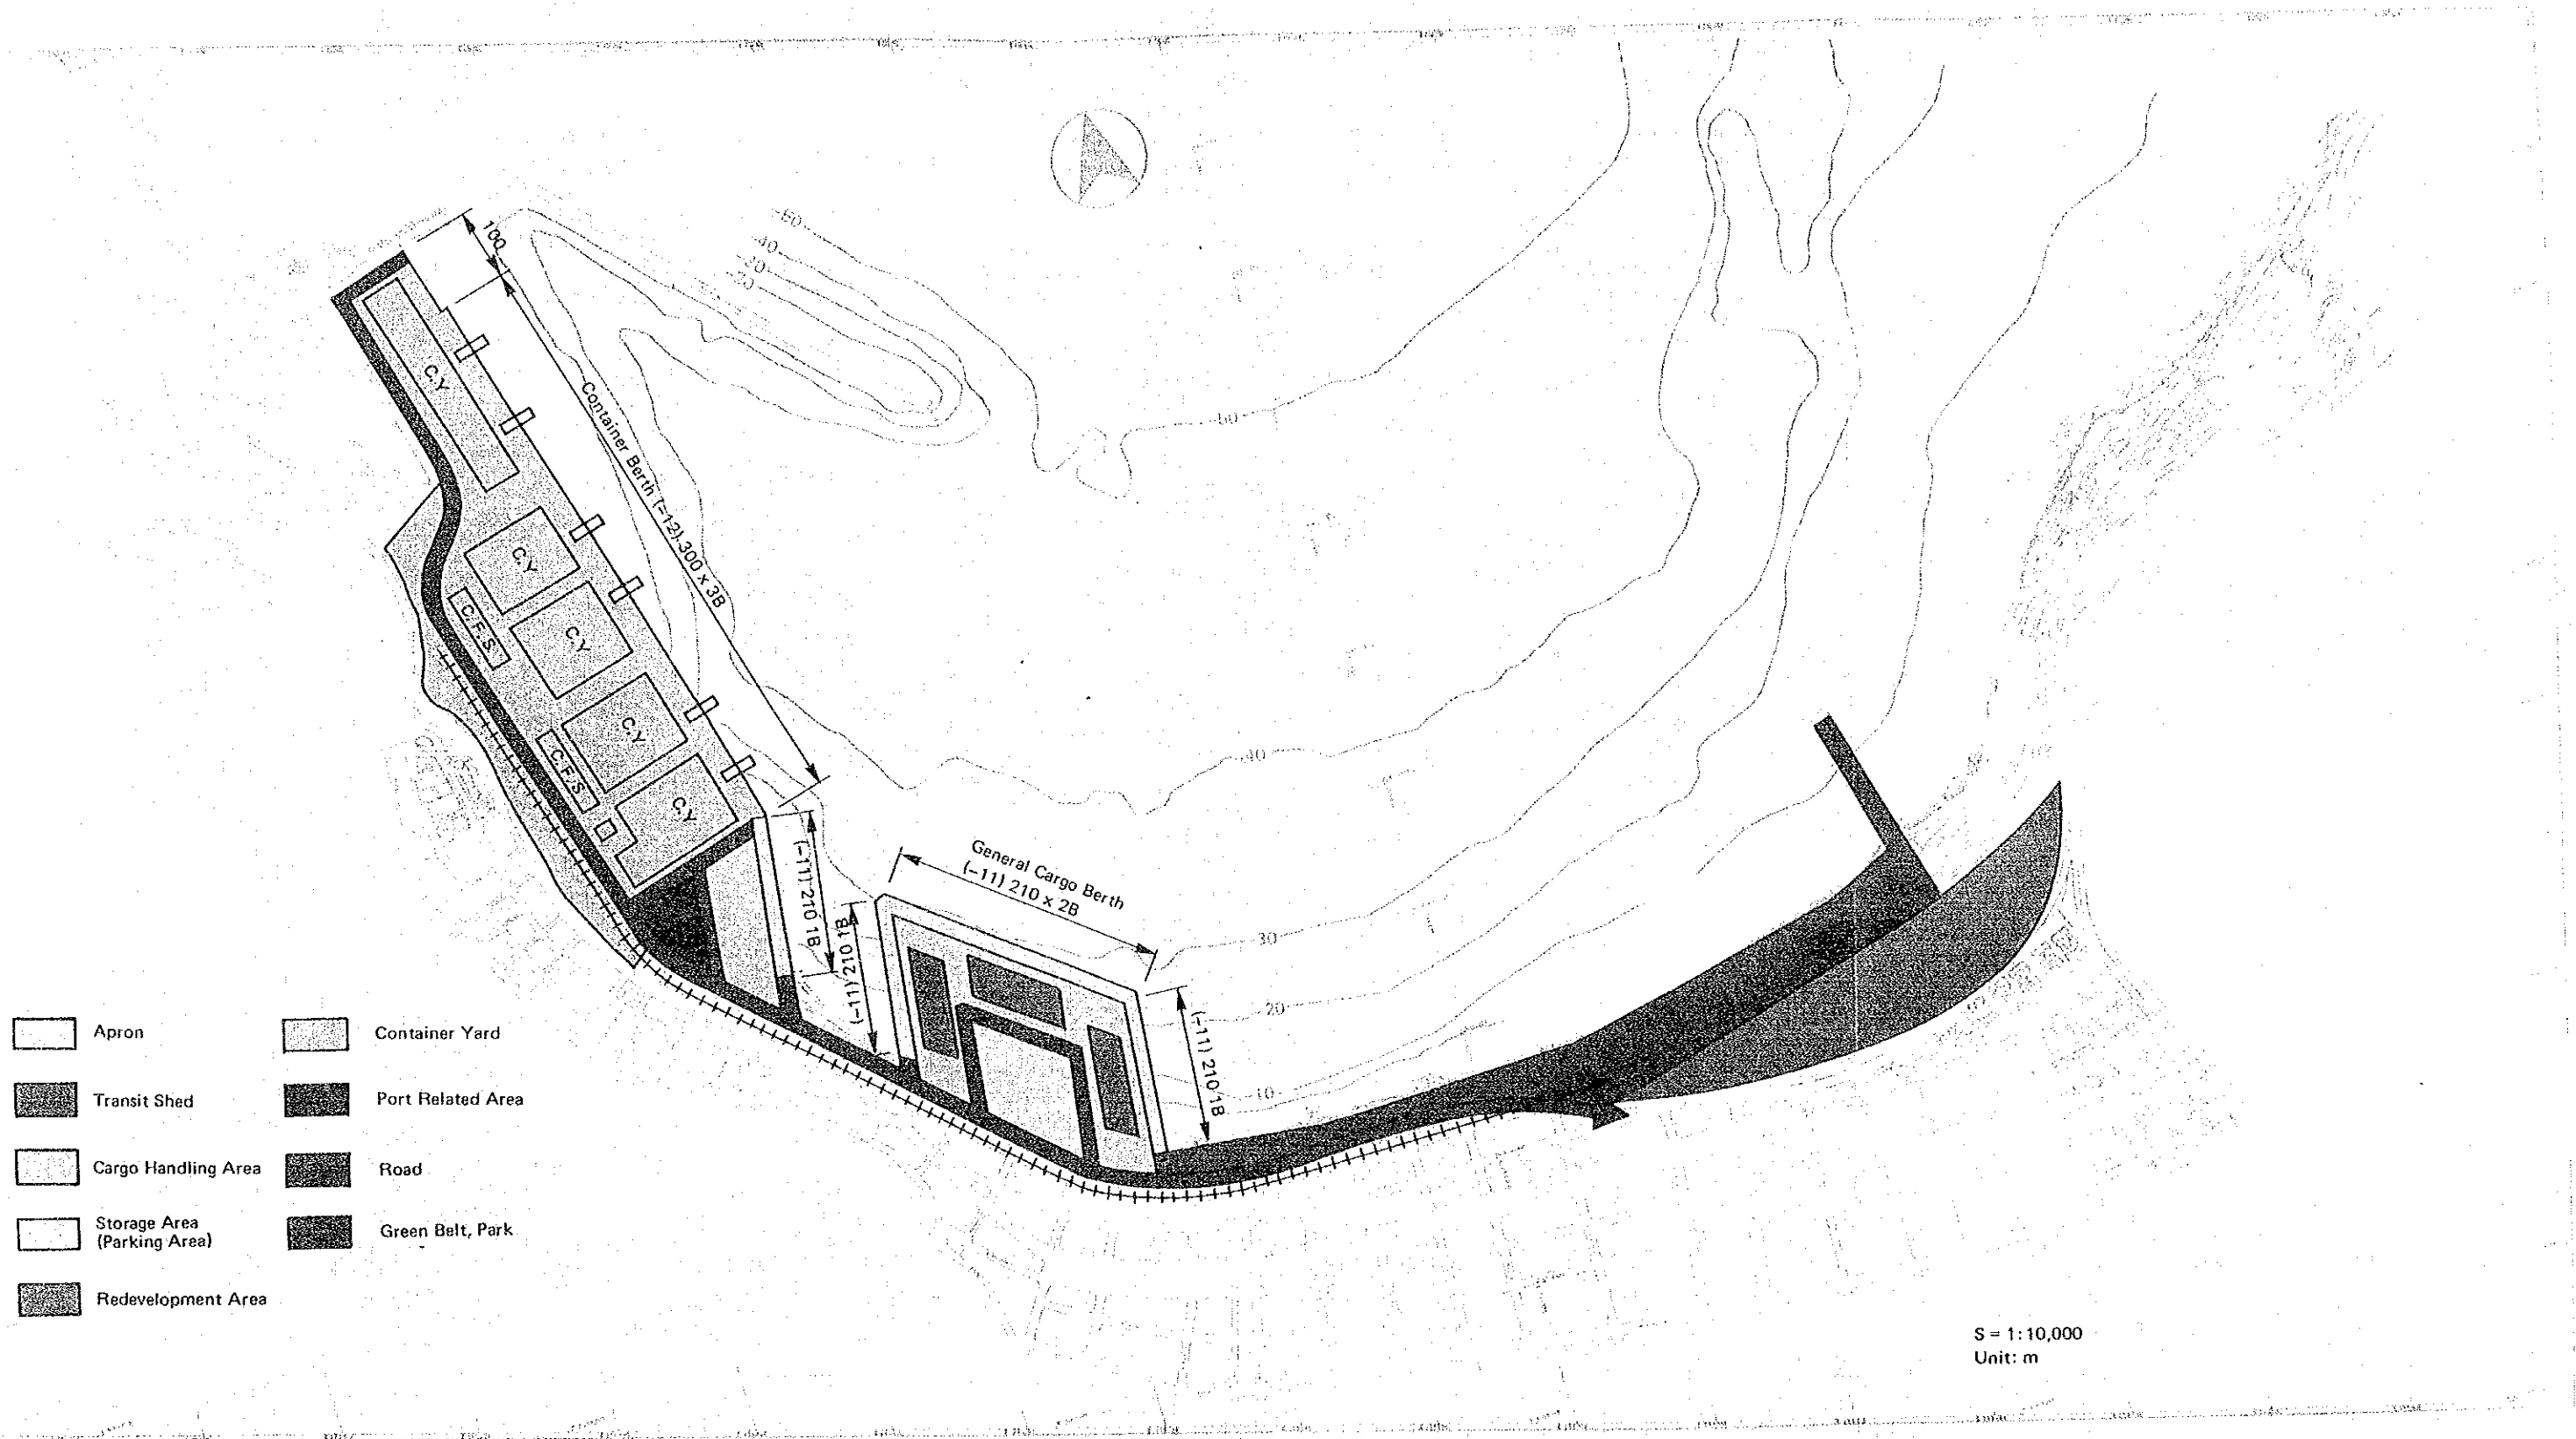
Master Plan of Valparaiso Port (2010)
